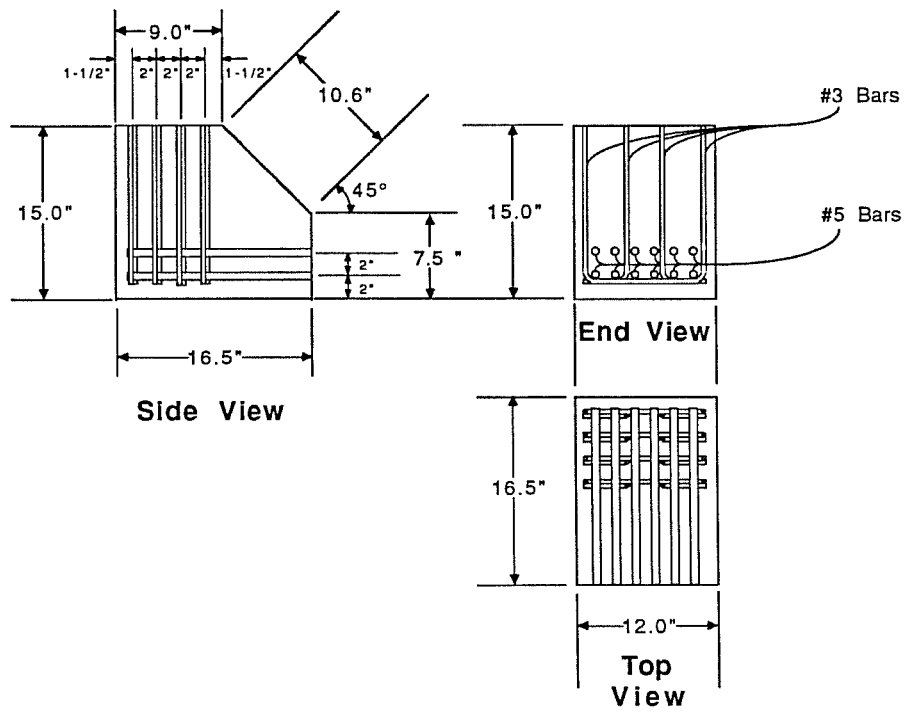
Geometry and Placement of Steel for Specimen HF5B
